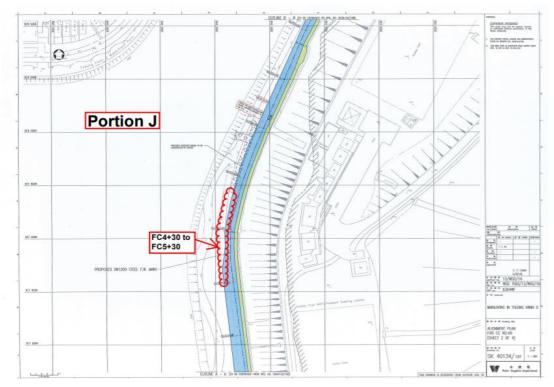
Location Plan – Landfill Stage 1 (Area FC4+30 -FC5+30)
